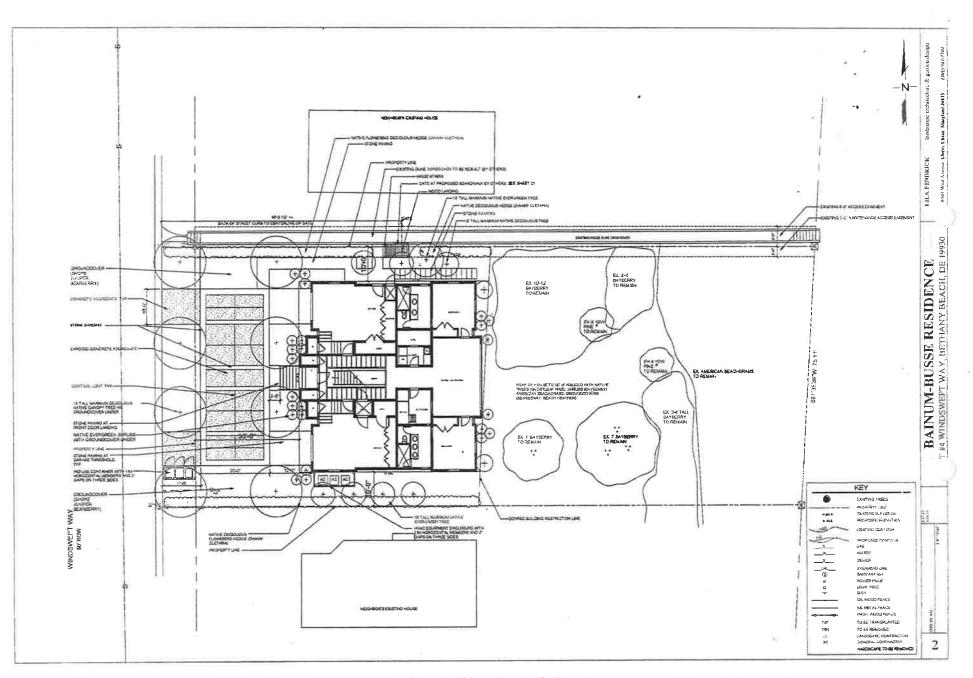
Proposed layout of structures/activities (prepared by Lila Frederick, Landscape Architecture and Garden Design).
